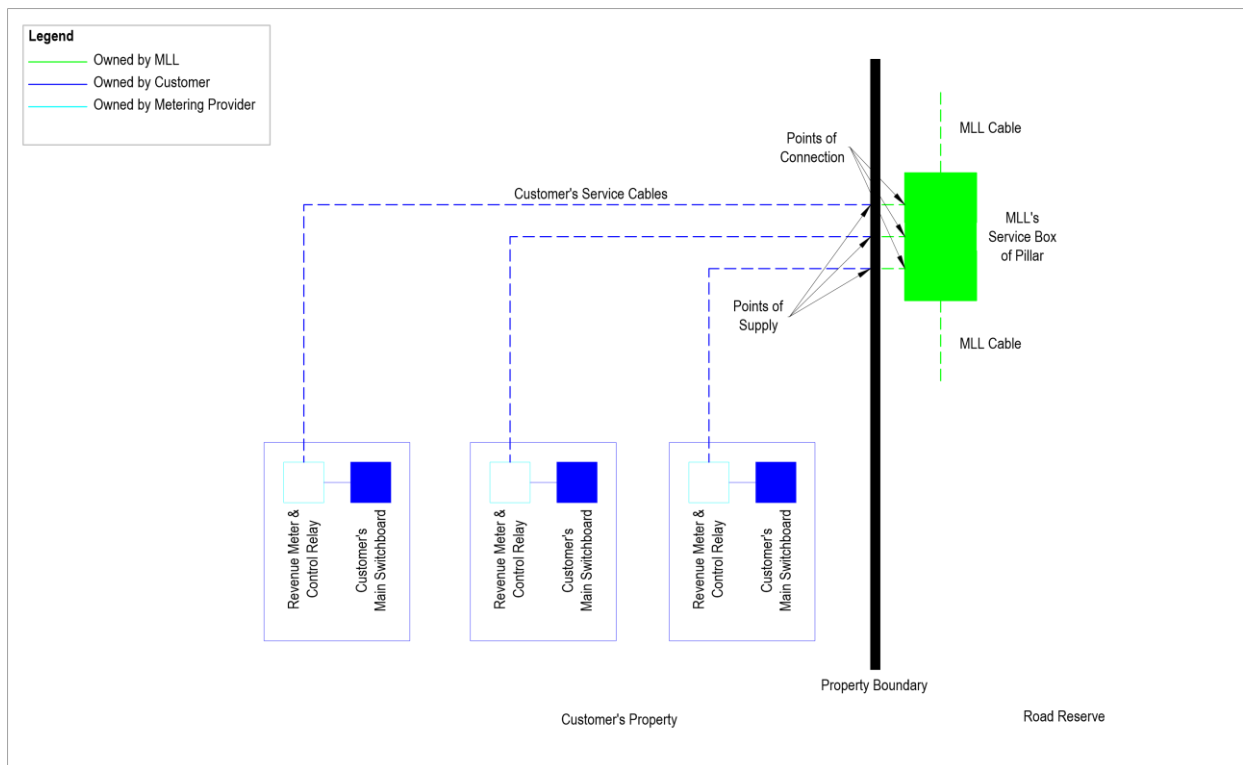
Multi-dwelling shared underground connection asset ownership
